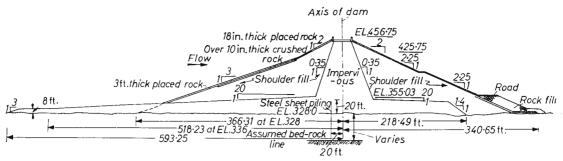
Typical section—Panchet Hill Earth Dam Section typique du barrage en terre à Panchet
